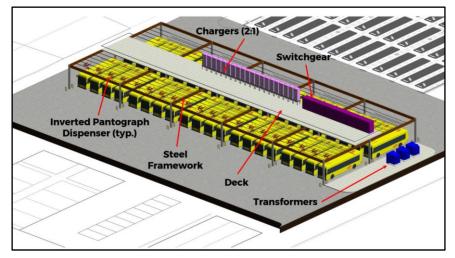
shows a rendering from the southwest of the proposed expansion.
